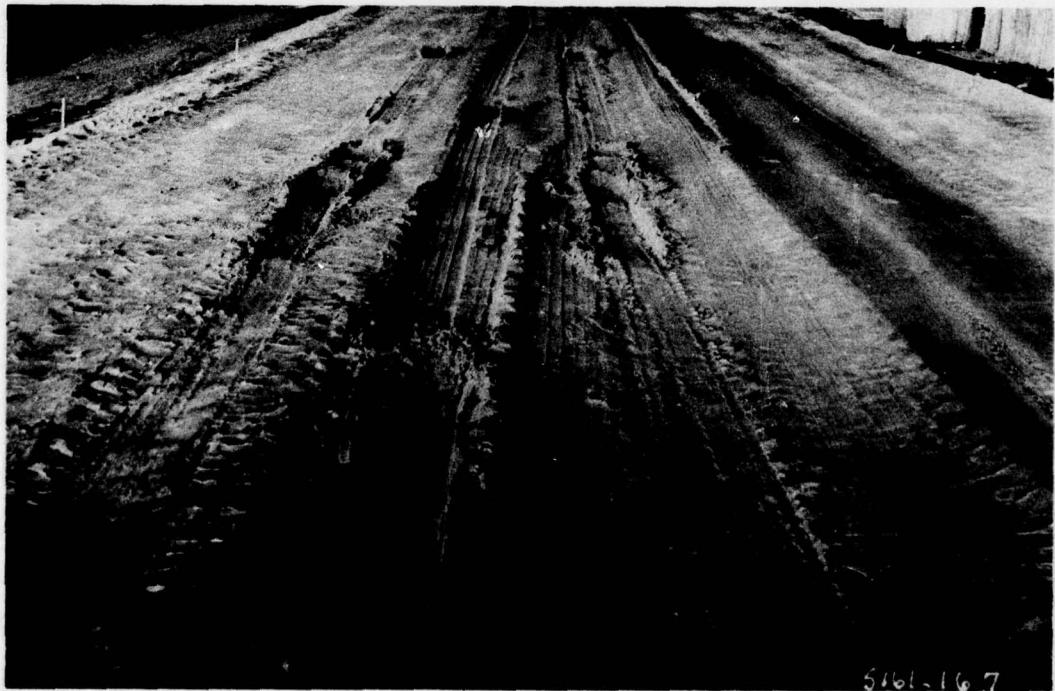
General view of Test Section No. 5 after four passes of F-4C load cart
